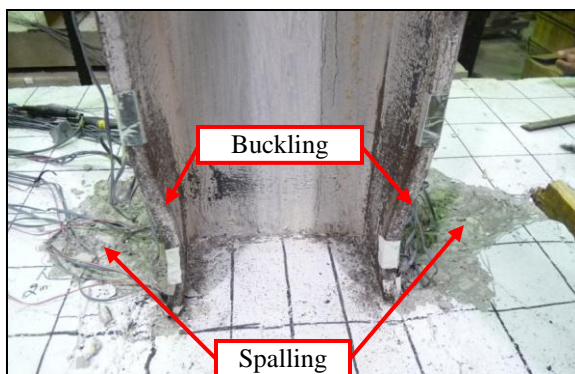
Buckling of HP 10 x 57 Steel Pile and Spalling Occurred to the Top Surface of the Abutment Cap
